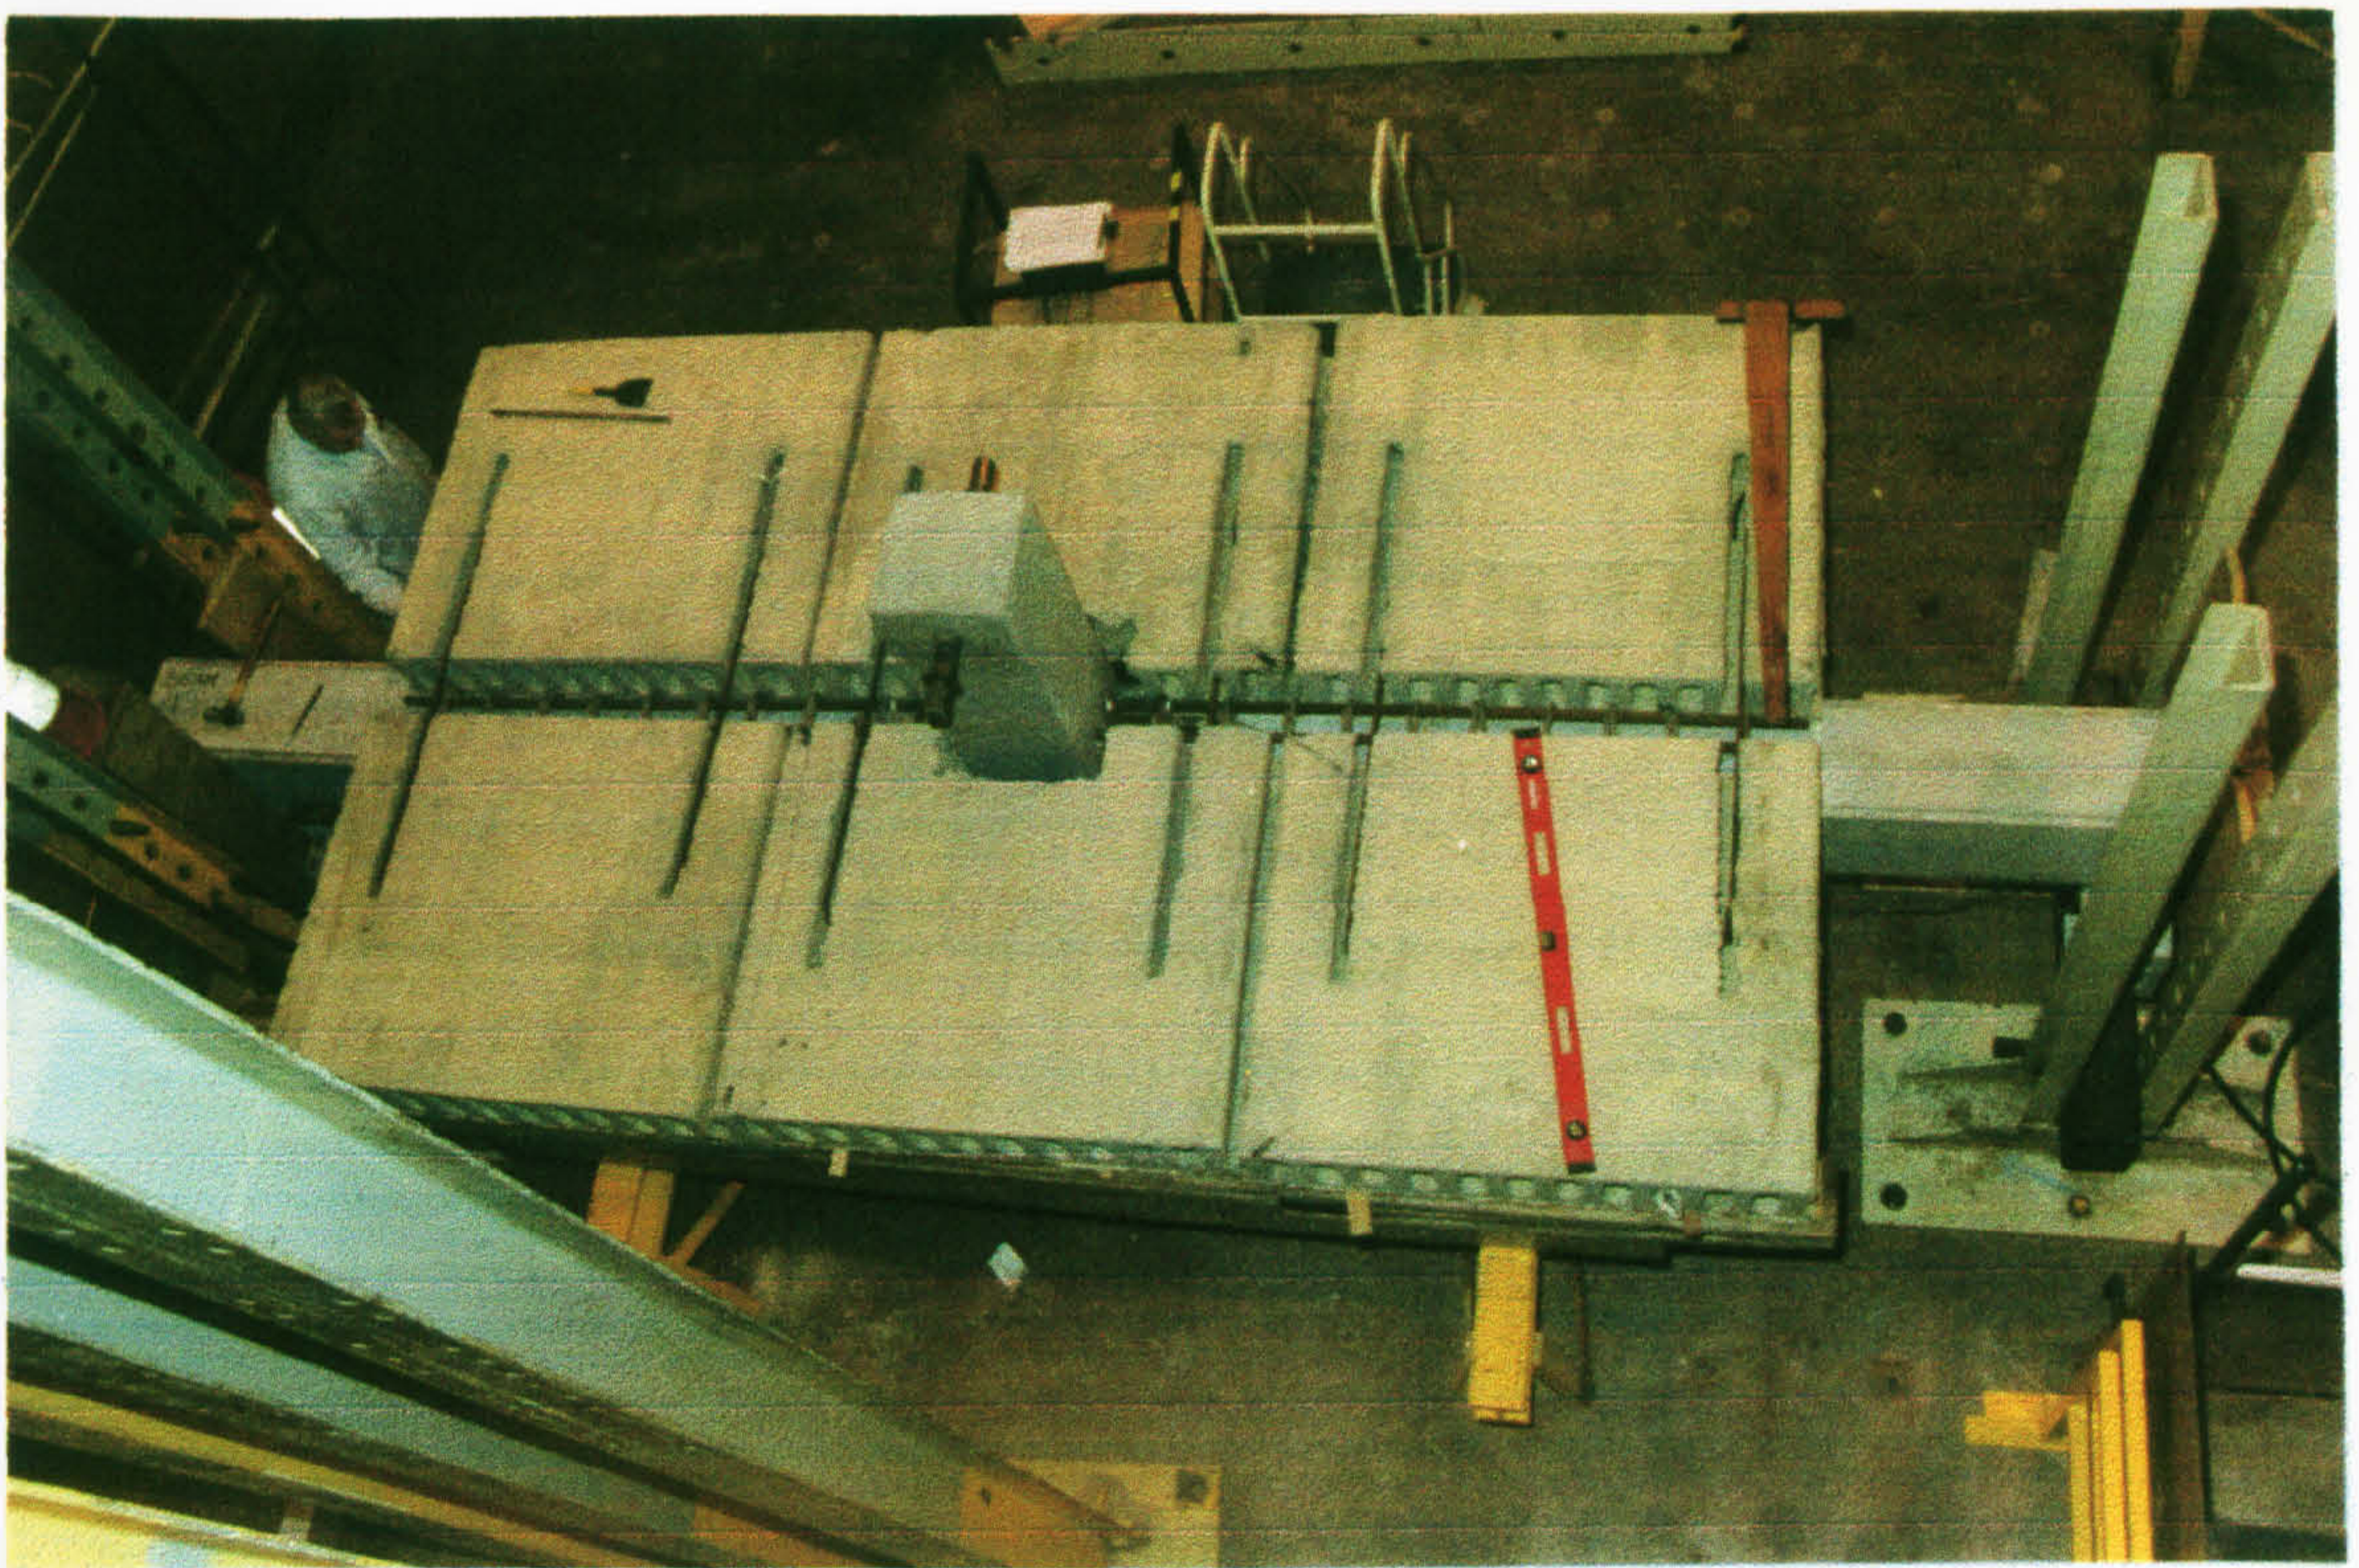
Subframe ready to cast slab-beam-column in situ concrete
